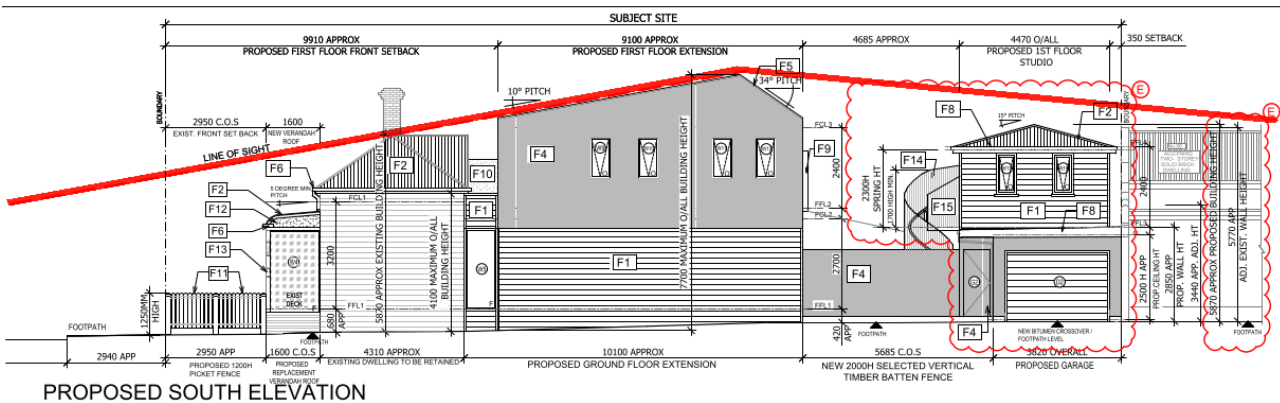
Proposed south elevation with transition in building heights across subject site to No. 96 Yarra Street shown by red line (Applicant Submission 4 March 2021 with Council’s Planning Officer’s annotations)
